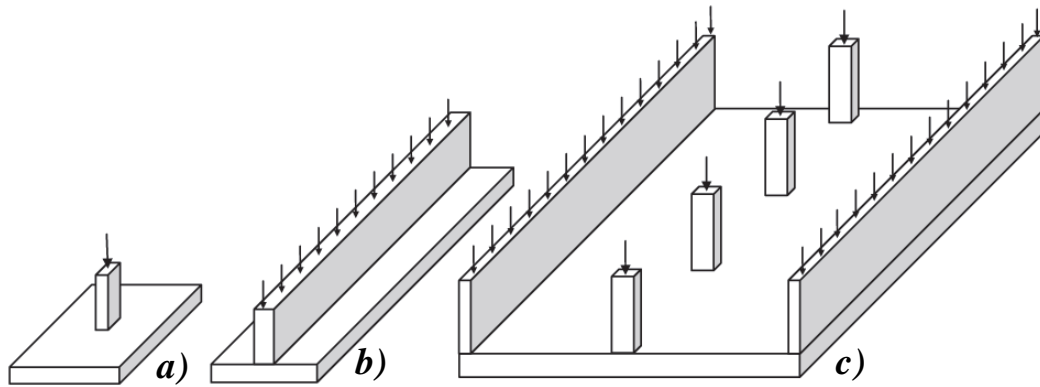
Types of shallow foundations: a) footing (pad footing), b) strip footing, c) mat or raft foundation after (Sivakugan & Pacheco, 2011, pp. 3-2)
